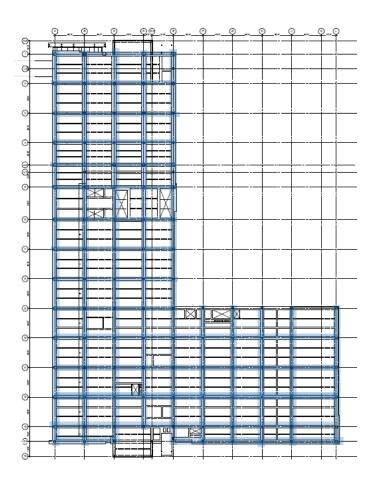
| Fourth Floor Diaphragm with Concrete Moment Framing Highlighted
